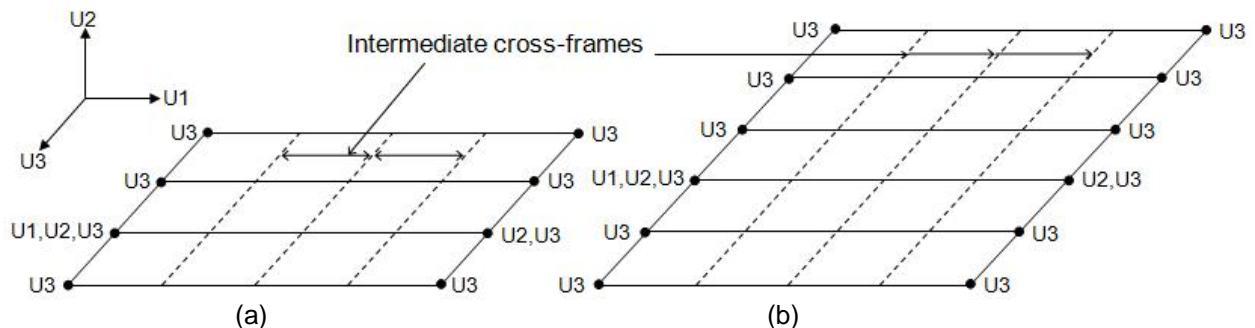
Boundary conditions for single-span bridge models: (a) one-lane bridge; (b) four-lane bridge
